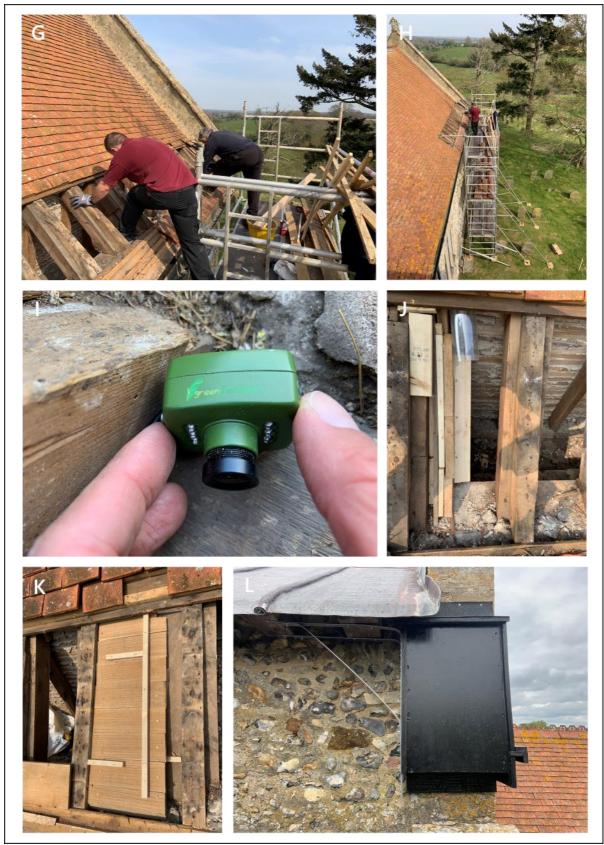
Photographs of exterior works (south side of chancel) – variety of roost features built into eaves roof void, including continuation of interior rafter bat boxes (K). Roost monitoring cameras installed (I). Large bat box fitted at south-east corner of nave (L).
